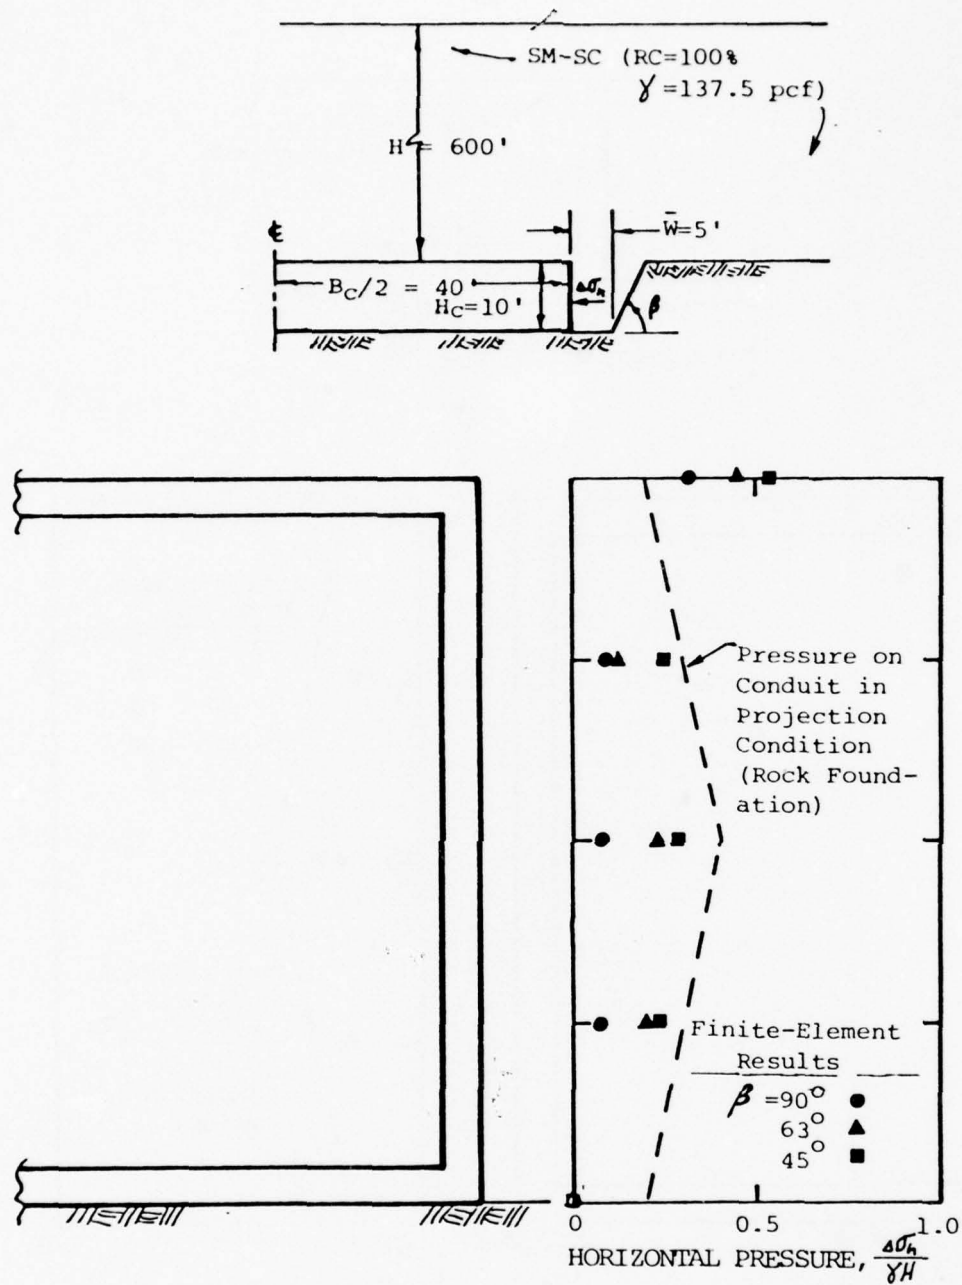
HORIZONTAL PRESSURES ON RECTANGULAR CONDUIT IN A SHALLOW TRENCH WITH SLOPING WALL
